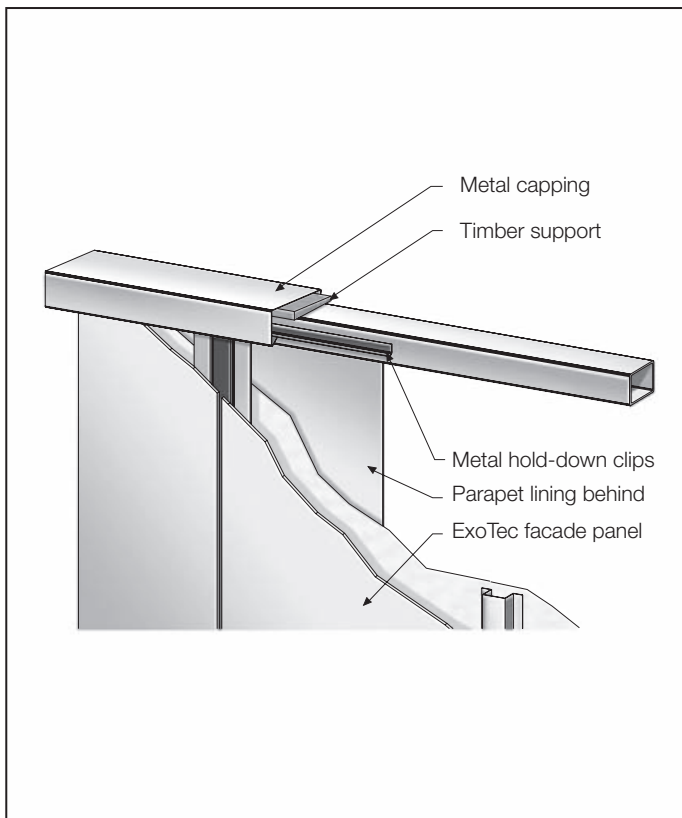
PARAPET CAPPING CUTAWAY DETAIL 1
